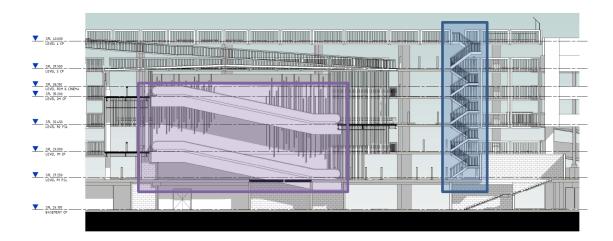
Section drawing showing the proposed travelators and emergency egress stairway
